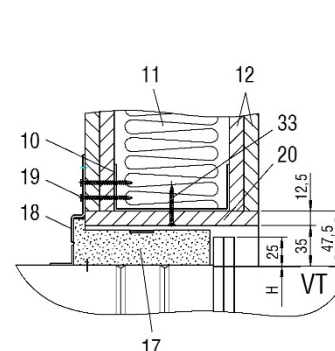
Dry installation in lightweight partition wall (F90) with installation frame type ER-P1 (section)
